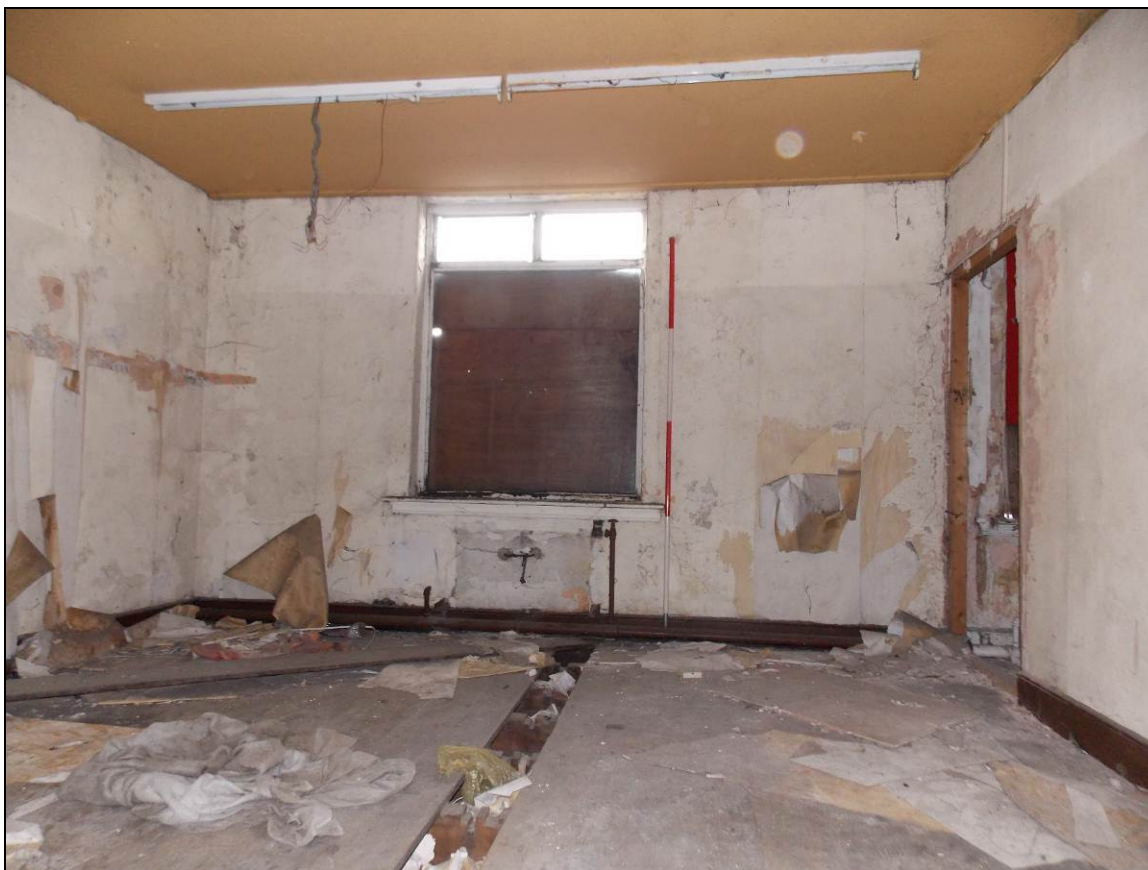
Window within the northern room of the first floor, looking south-east (scale 2m).
